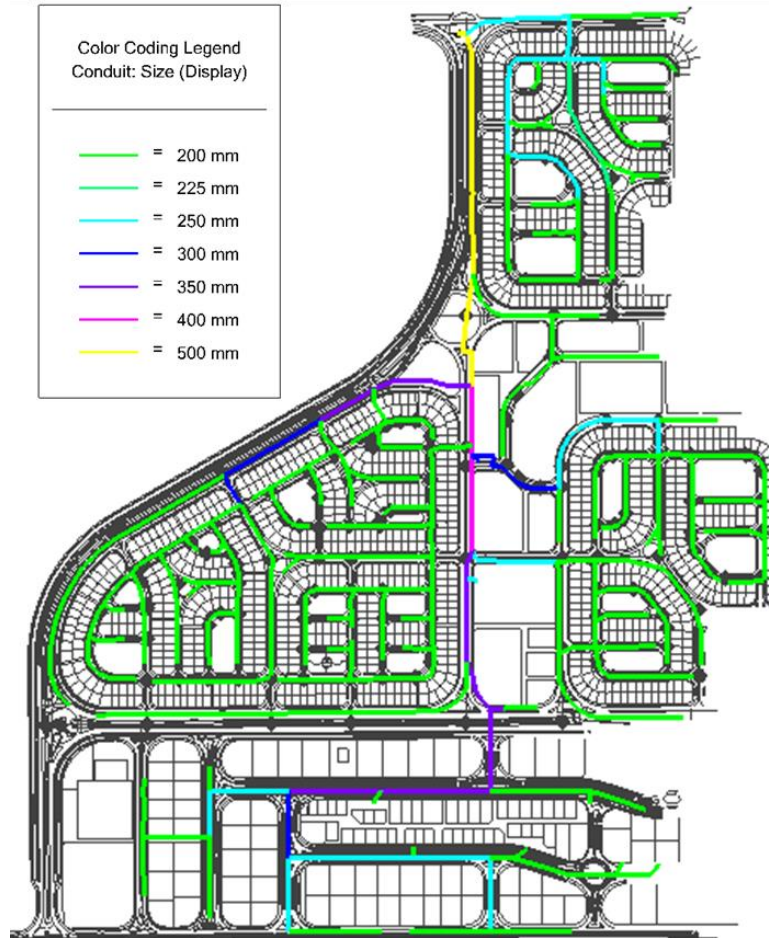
Al Academy El-Fareeya Pipes Layout and Diameters
